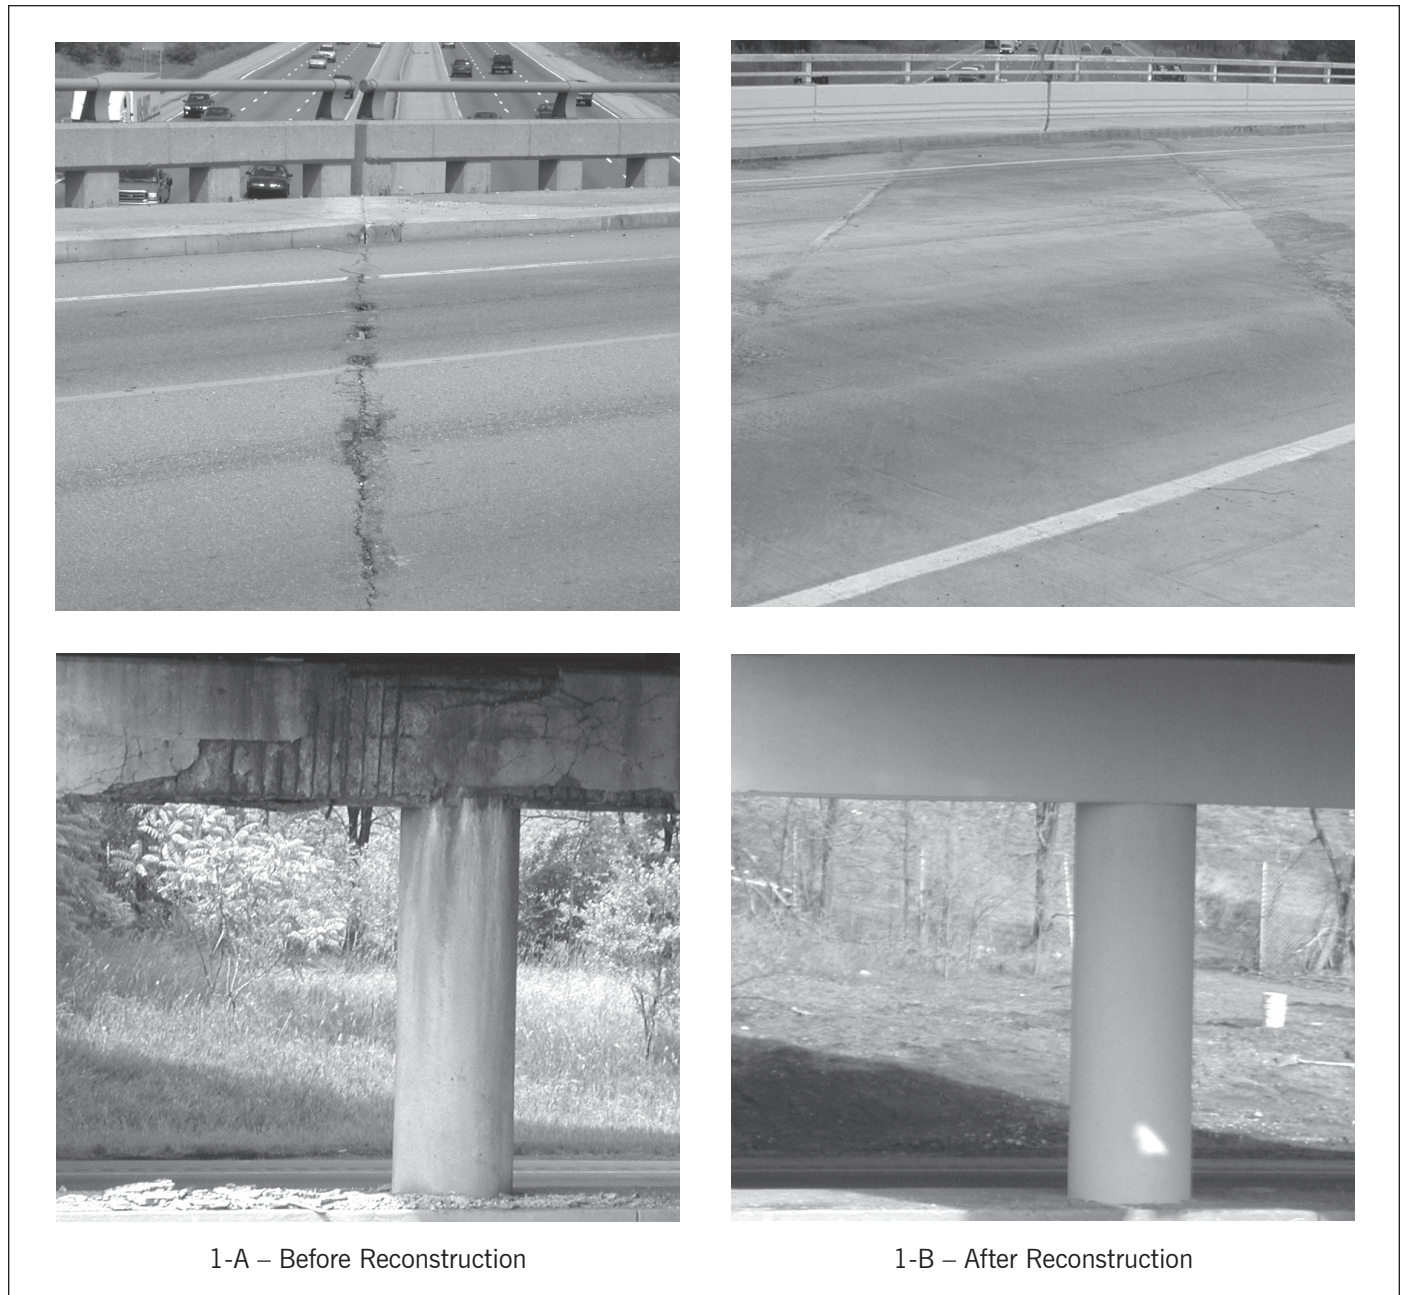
Slab and Support on Grove Street Bridge in Ypsilanti, Michigan, Before and After Reconstruction.
